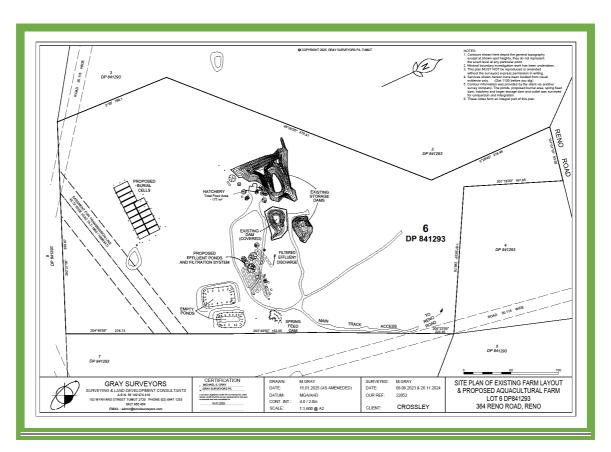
Site Plan showing Farm Layout. (dam & pond locations, burial cells, & effluent ponds)
